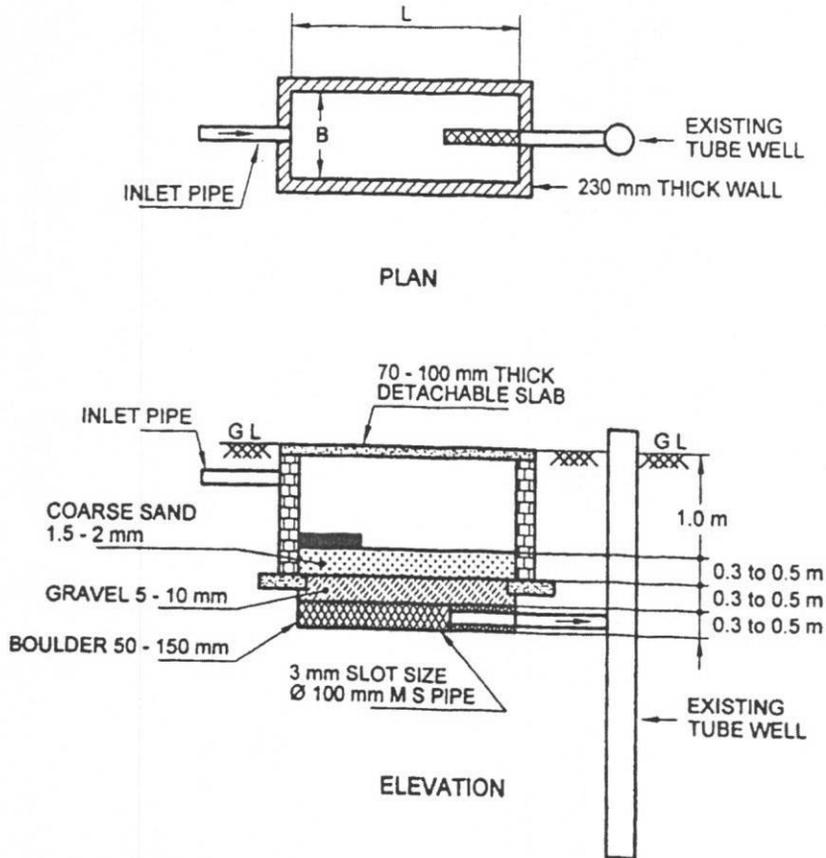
RECHARGE THROUGH EXISTING TUBE WELL
